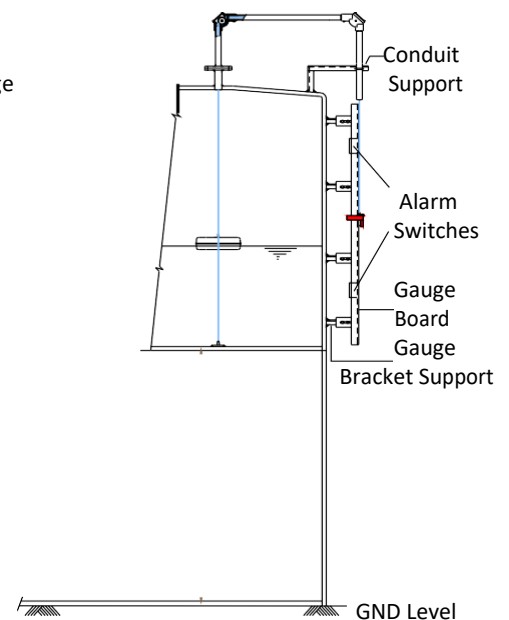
Gauge Board with Full Travel mounted on Side of Elevated Tank
